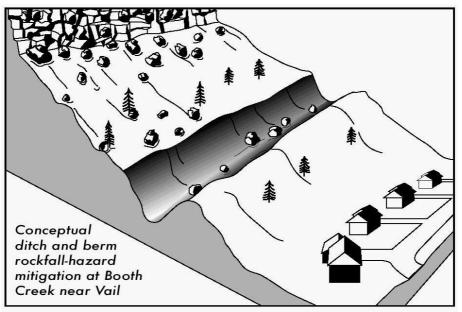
Berm and Bench as Rockfall Protection (Colorado Geological Survey, 1998).
